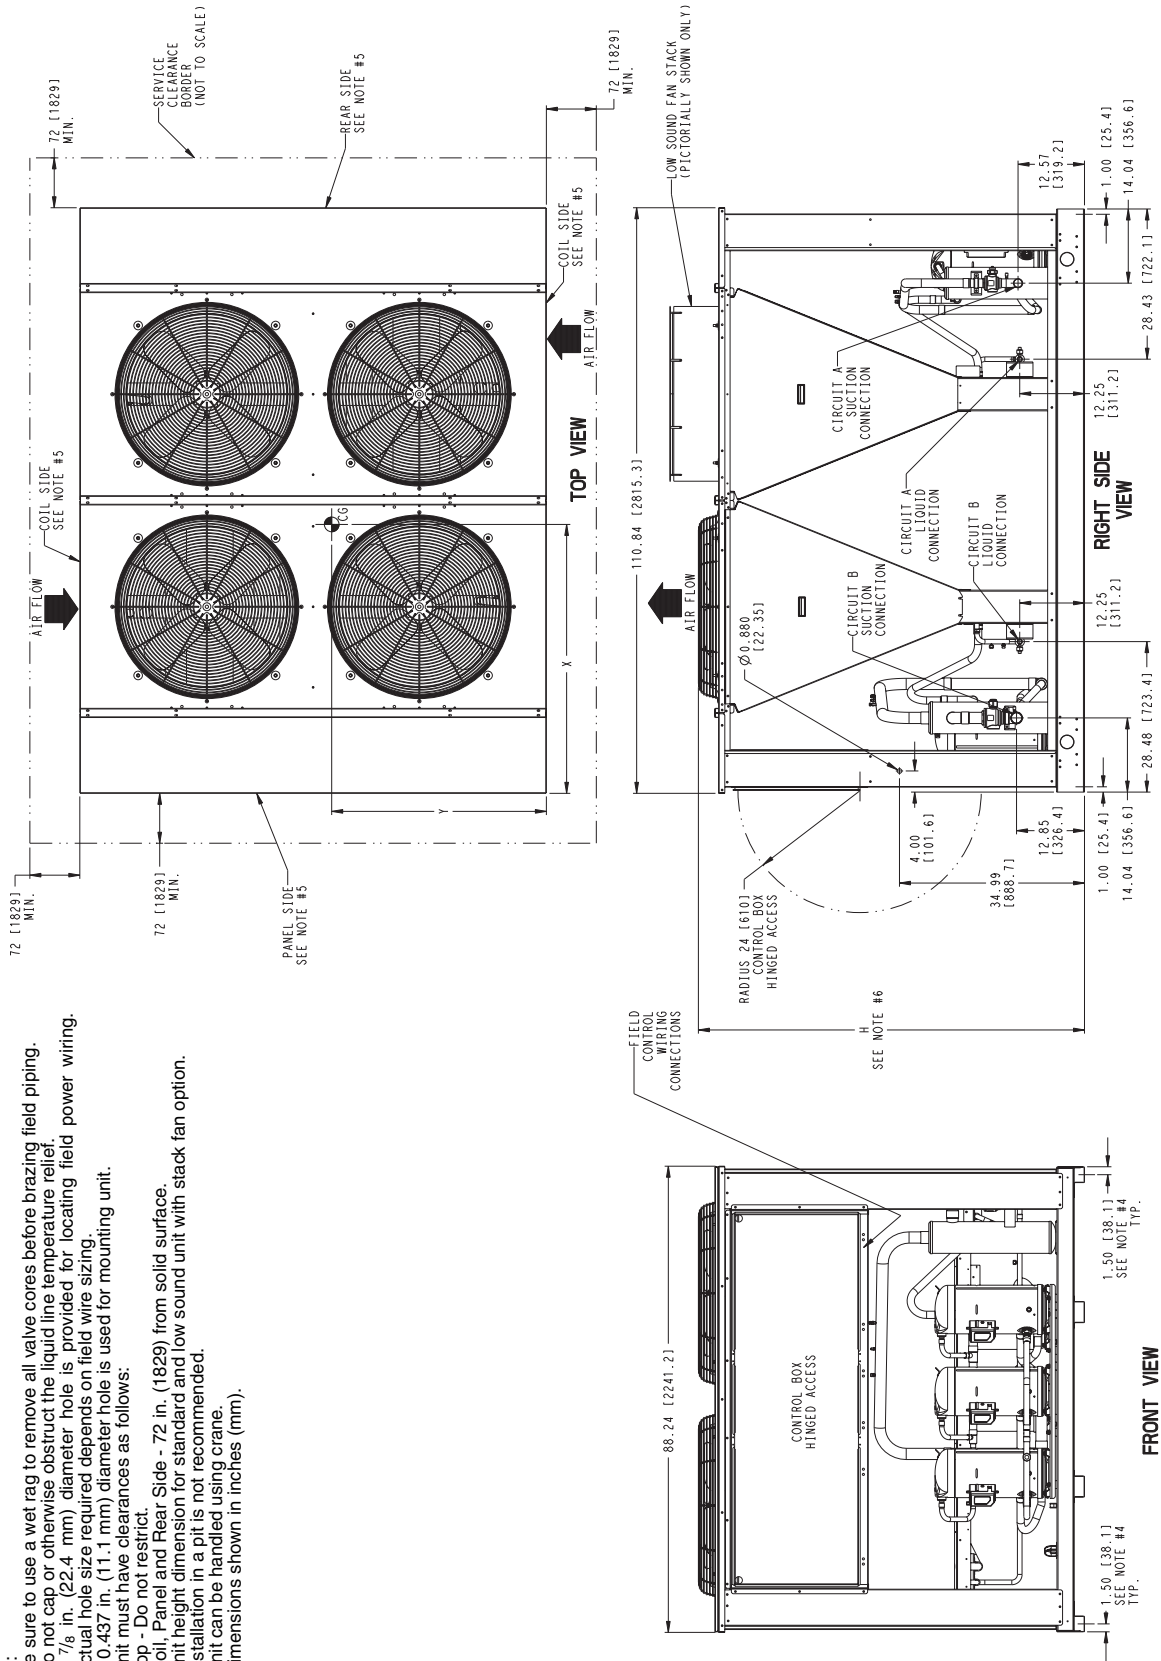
38AP Unit Dimensions, Sizes 040-060
